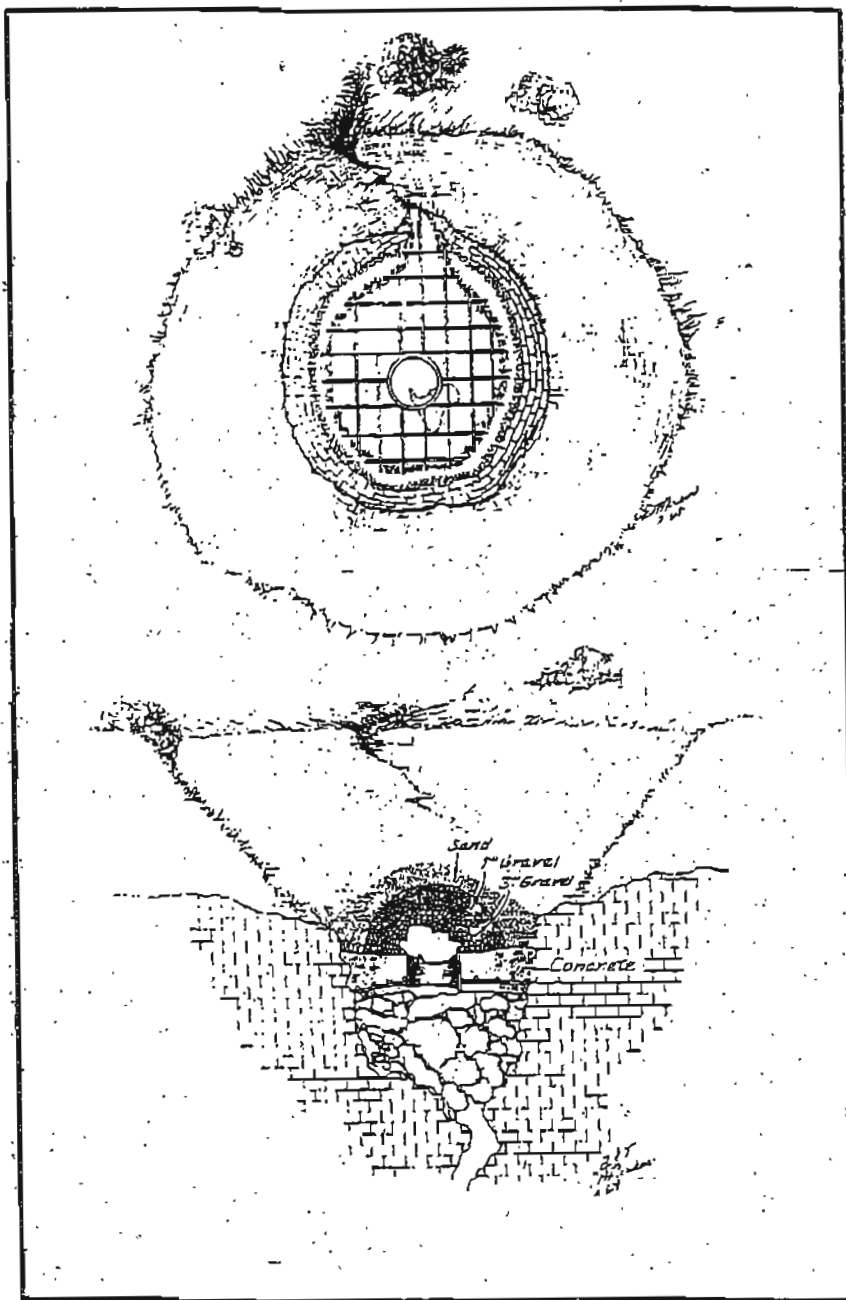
Artist's rendition of an inverted graded rock filter used to fill a regolith arch collapse. Note the reinforced concrete cap used to stabilize the broken fill in the sinkhole.
